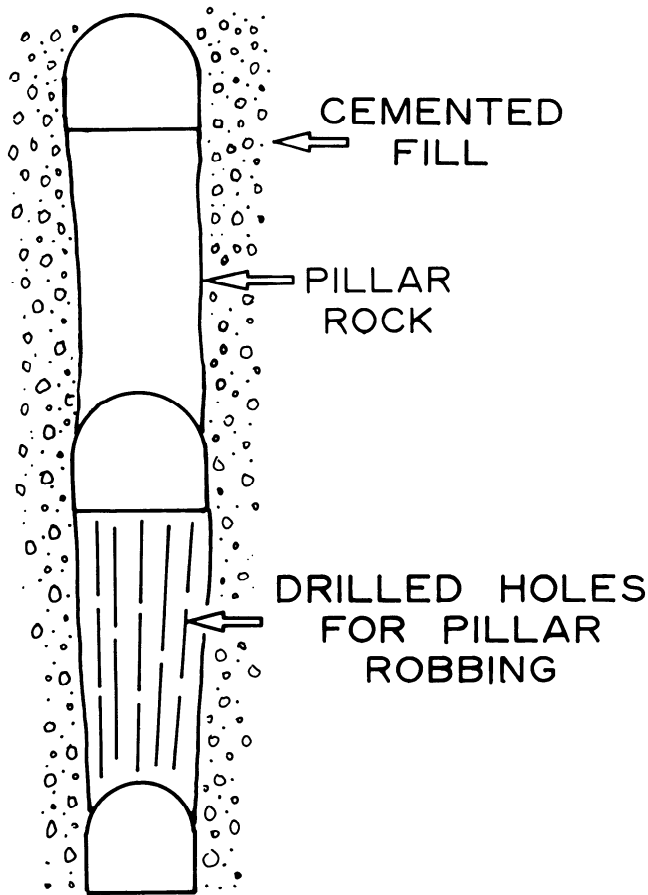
Pillar robbing cross section general arrangement, Cannon mine.
